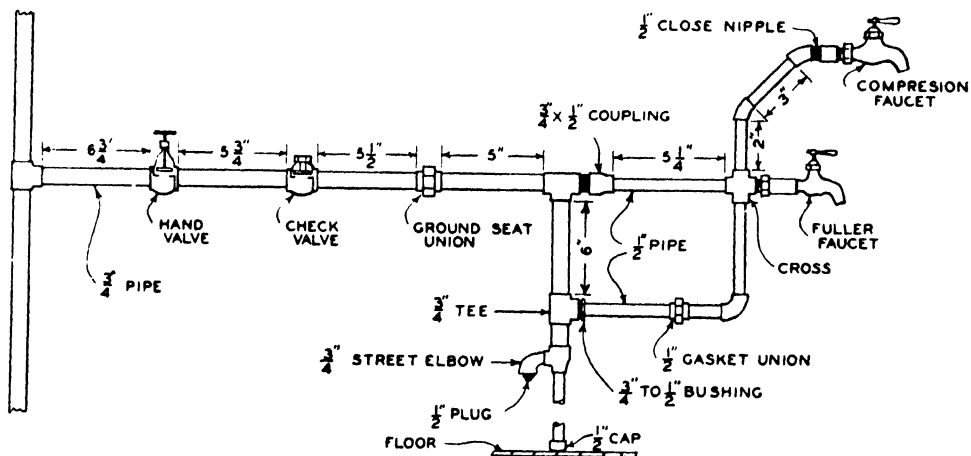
A piping assembly suitable for practice in cutting pipe and “making” joints. This assembly contains the most common pipe sizes and the most common valves and fittings used in farm plumbing. When the assembly is completed the water pressure can be turned on it to test the joints, the valves, and the faucets. The faucets and valves may be used for practice in faucet and valve repair.
